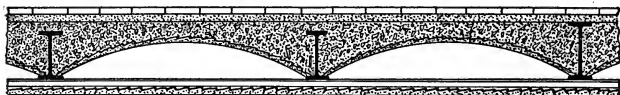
Expanded Metal Co.'s Concrete Arch.
